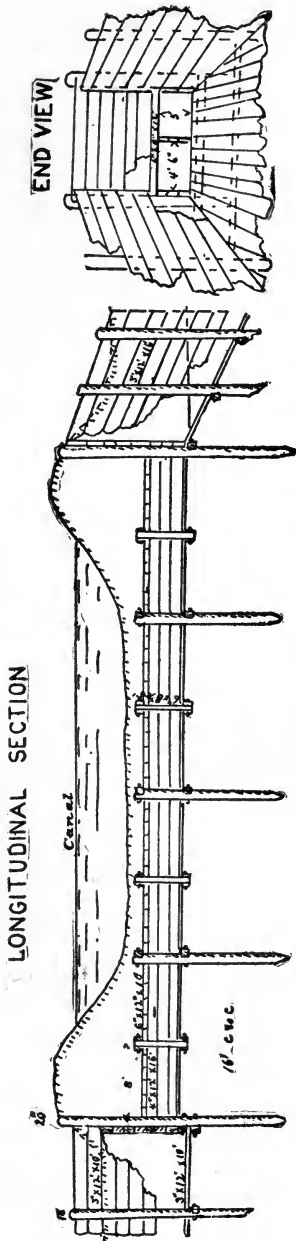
SECTIONS OF WOODEN SIPHON, DEL NORTE CANAL.
